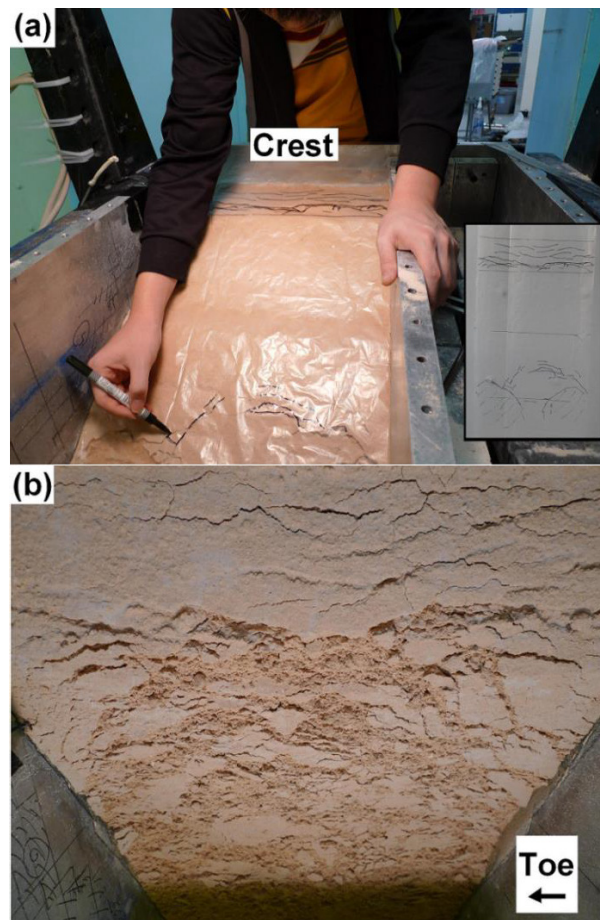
View of the slope at failure (Test 5): (a) local failure at the toe and cracks at the crest after first increment, (b) Global failure as viewed from the crest.
